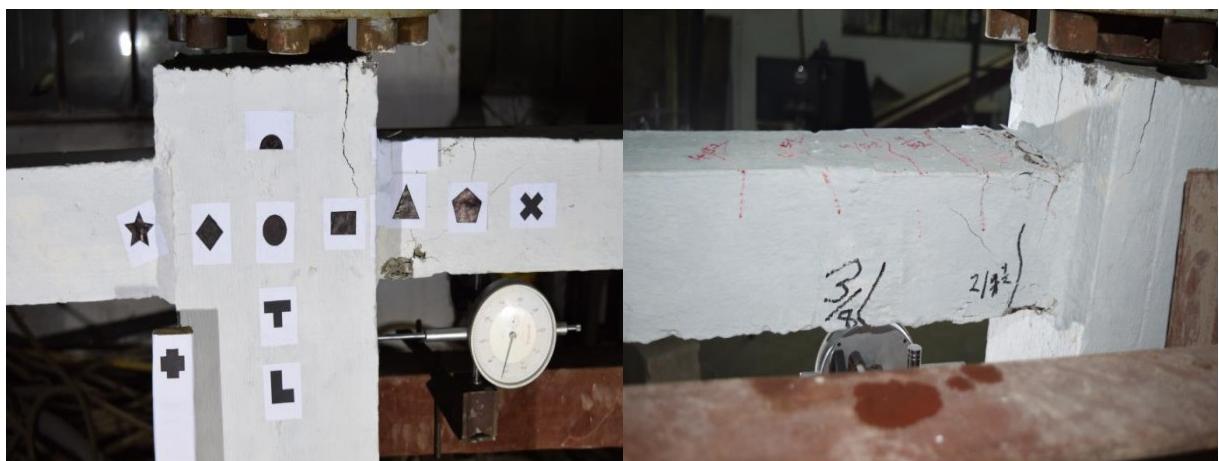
Crack in the Front of Left Beam Column Joint
